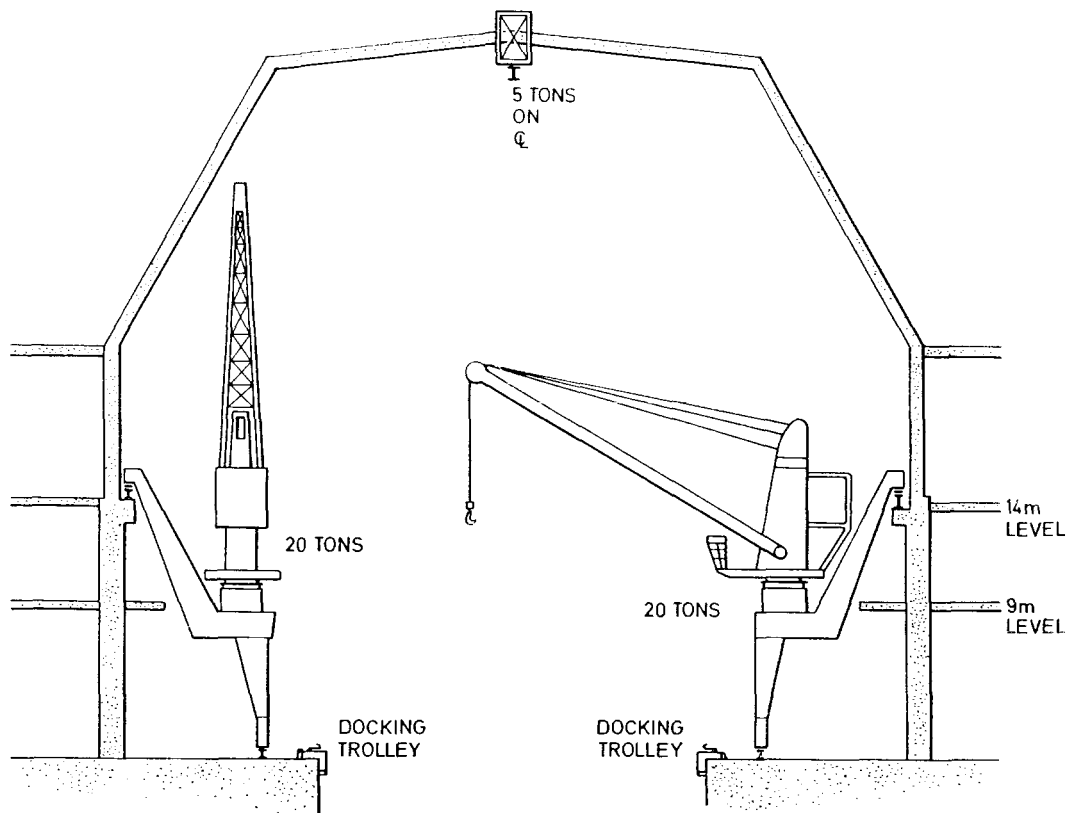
CROSS-SECTION OF COVER SHOWING DOCK CRANES
